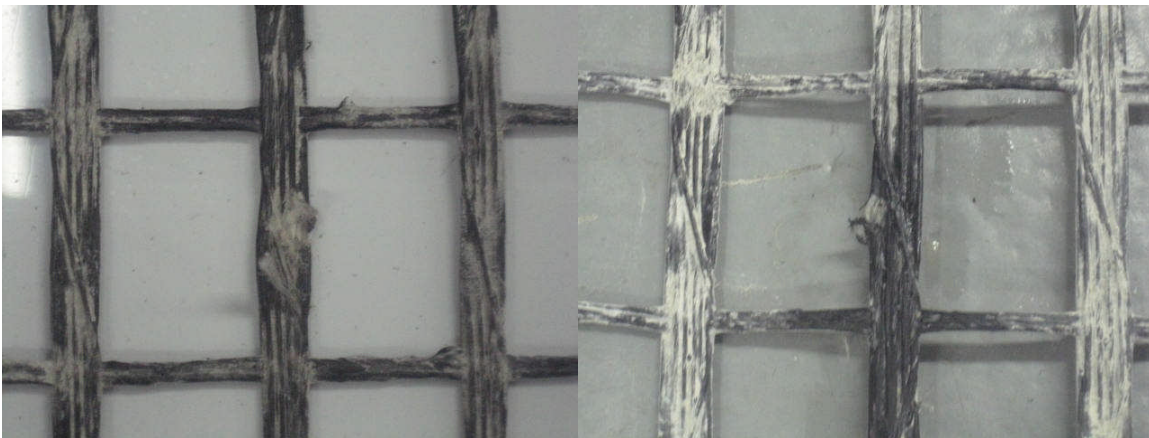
Photos of typical visual damage of 8XT installed in soil gradation 1.
